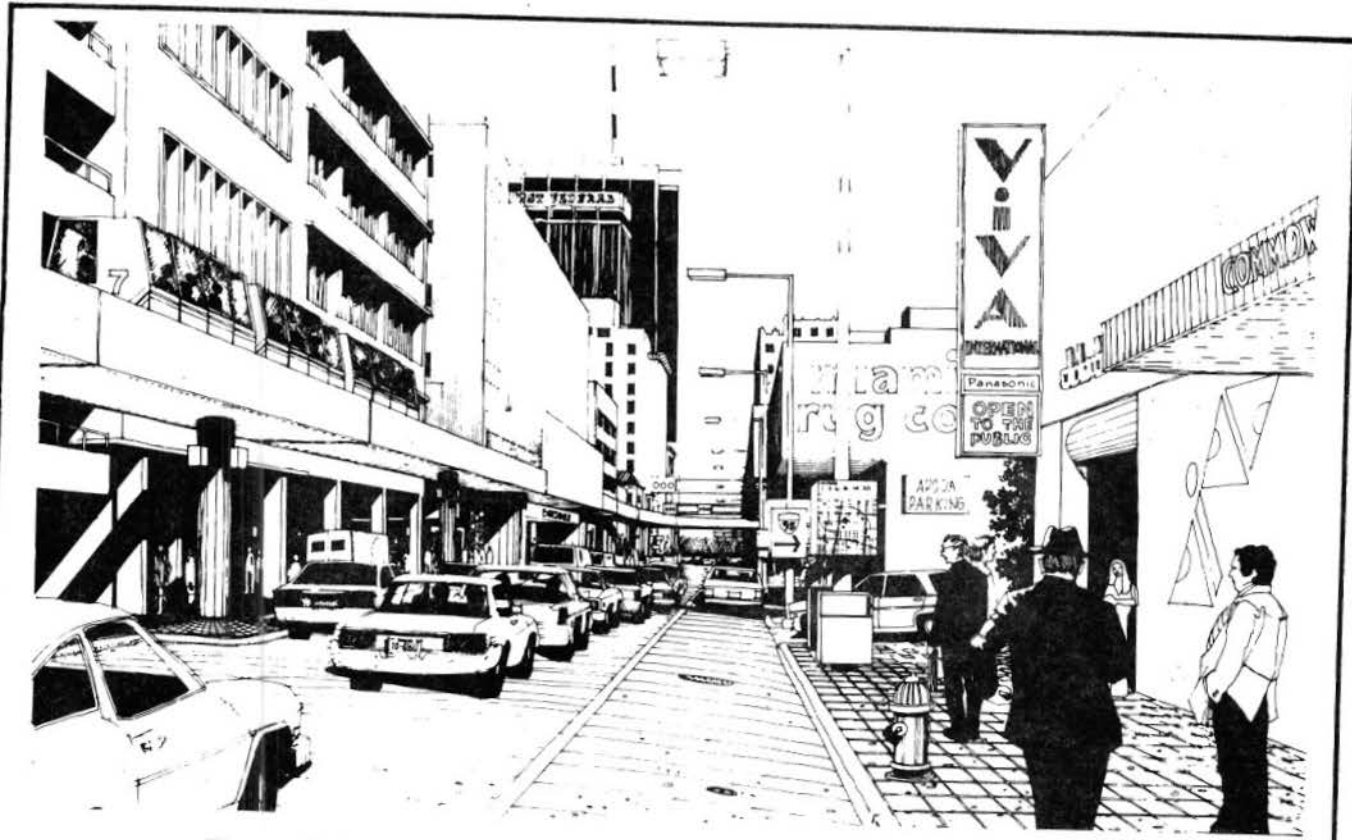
PROPOSED—S.W. 1st STREET LOOKING EAST
